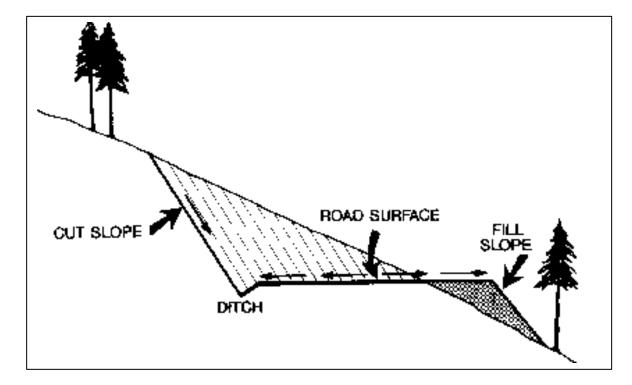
Typical Cross-Section (Prism) of a Forest Road.
